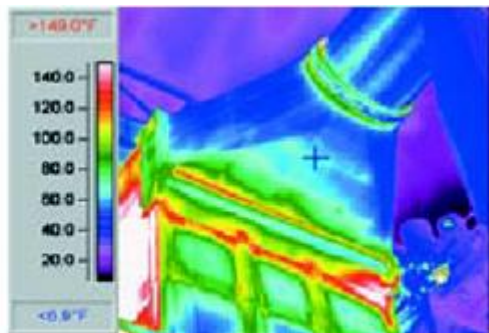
Infrared photo of the same panel system showing high surface below the connecting horizontal duct.
